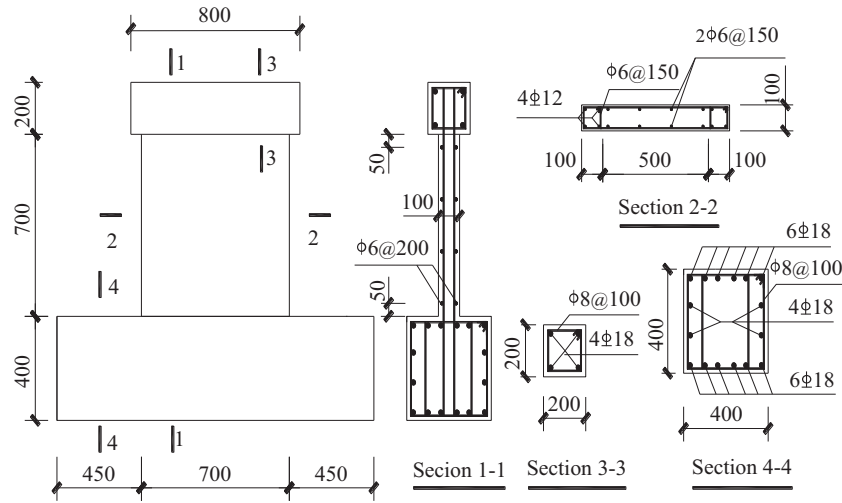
Dimensions and reinforcement details of the wall specimens (unit: mm).
